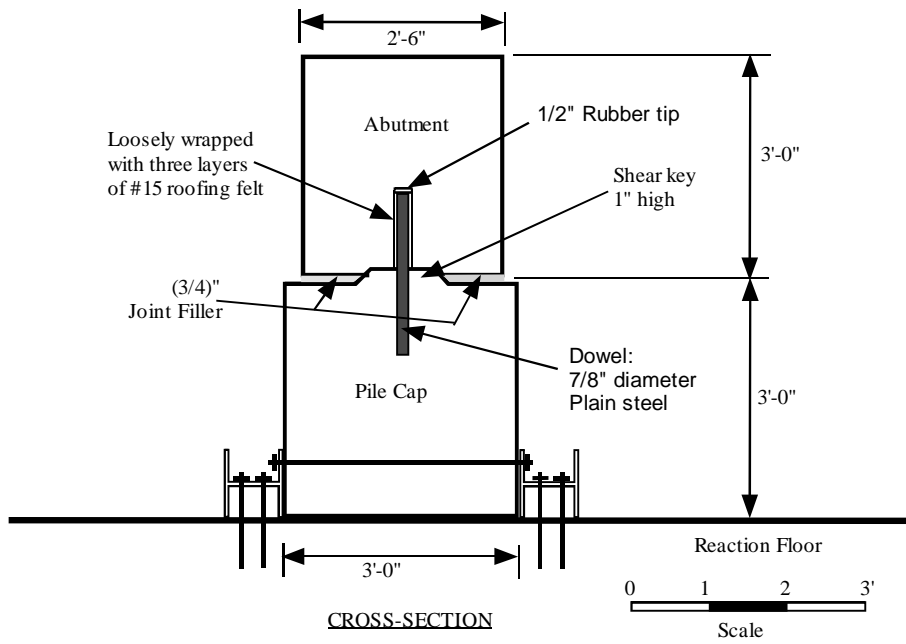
Drawings of VDOT semi-integral abutment with a concrete shear key
